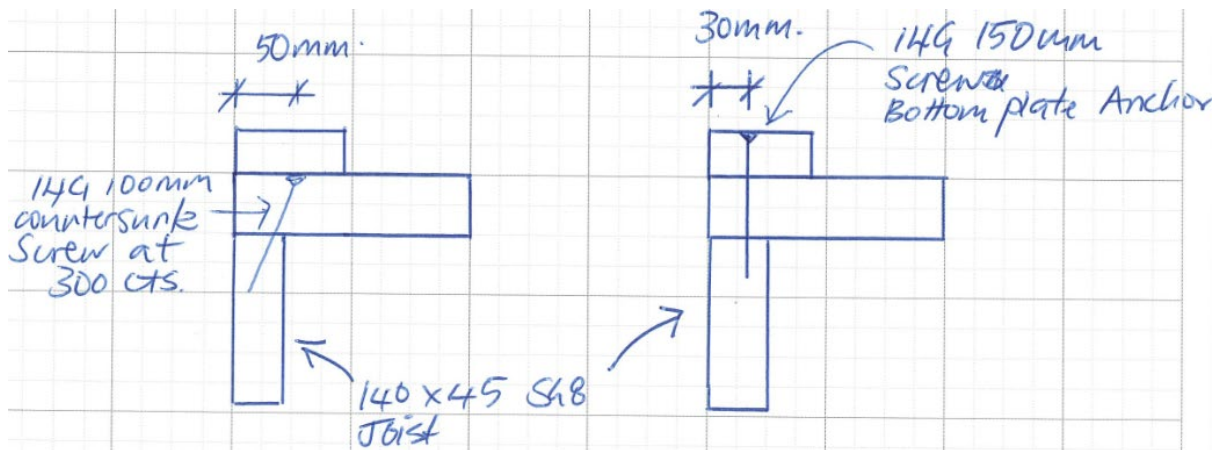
Section of panel fixing to joist (a) and bottom plate anchor fixing (b).
